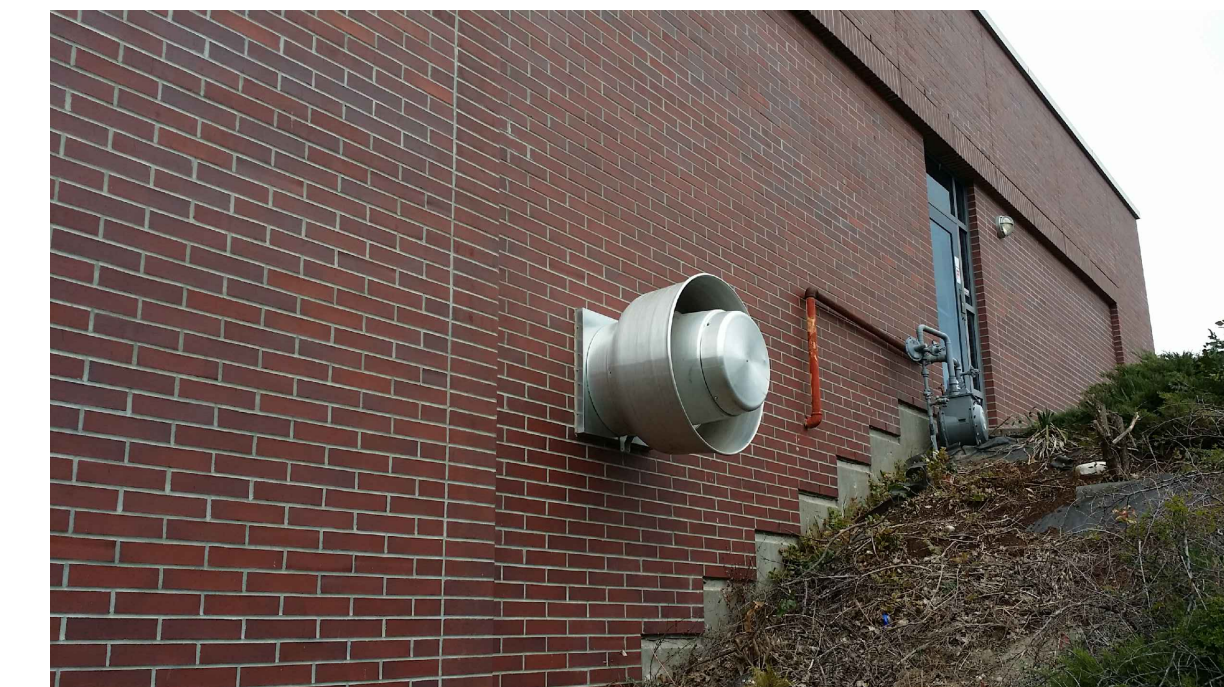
VIEW OF EXTERIOR WALL AND FAN AT GRIDS K/1-2
